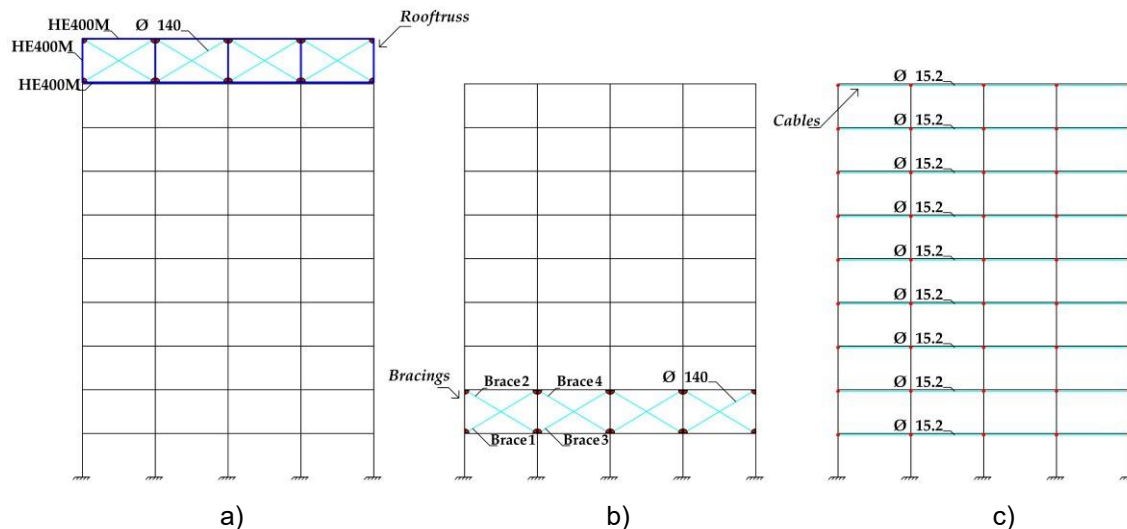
Retrofitted structures: (a) Roof-truss, (b) bracing, and (c) cable systems.
